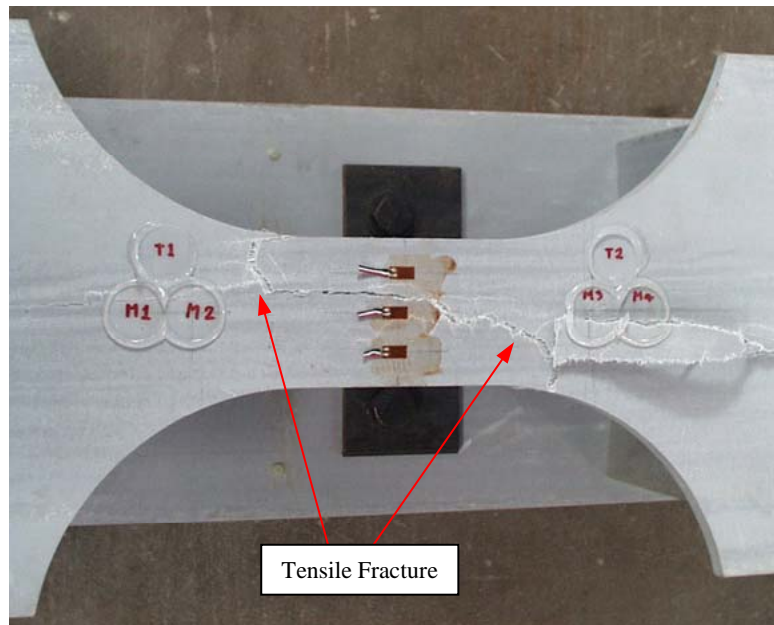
Bottom Flange at Failure of Beam FGI
